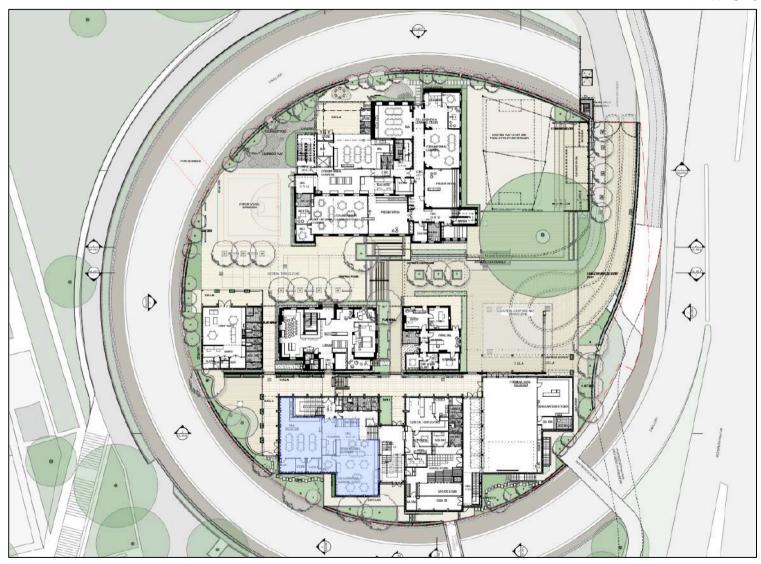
Proposed Ground Floor Plan (Source: FJMT Studio, DWG DA-2002, 18.12.2019)
